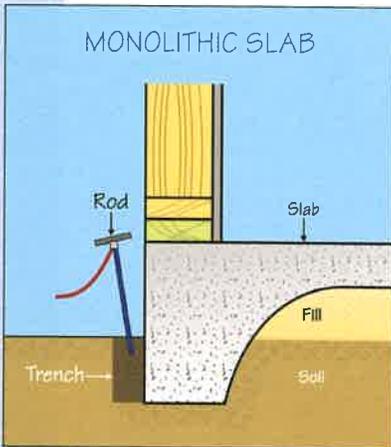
Typical placement of termite treatment (shaded) in a monolithic slab.
